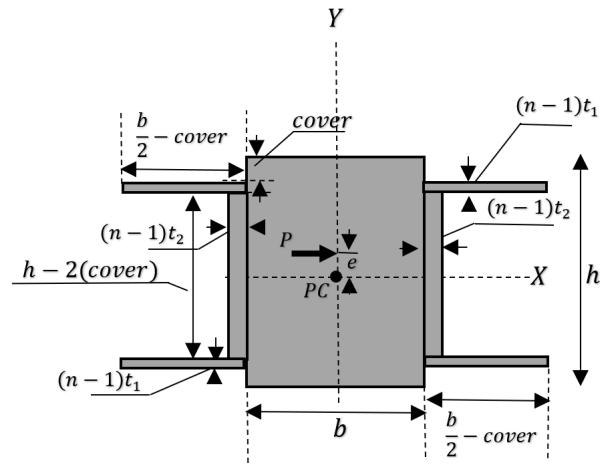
Transformed cracked cross-section mechanism with symmetric reinforcement..
